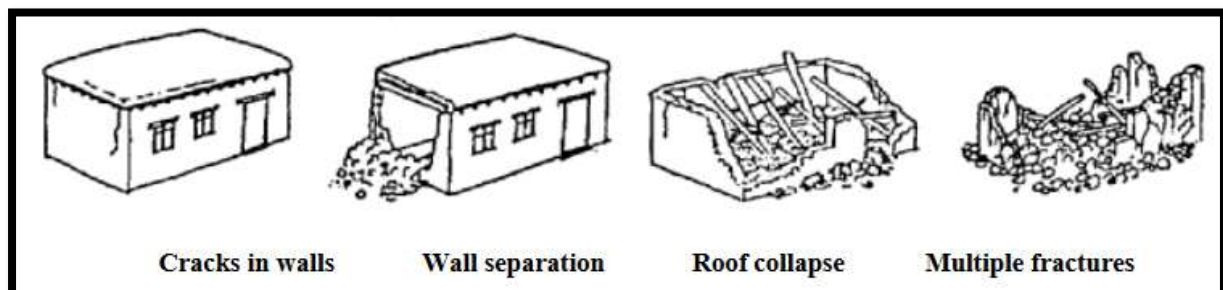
Typical damage pattern of unreinforced masonry buildings after Coburn (1986)
